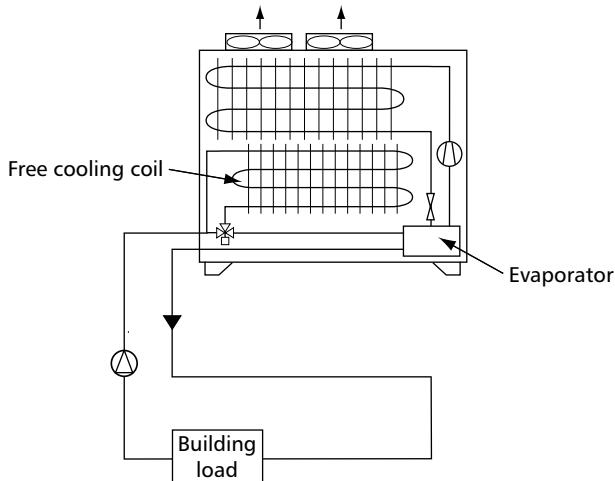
Chilled-water free cooling using an integral free-cooling coil in a packaged chiller
